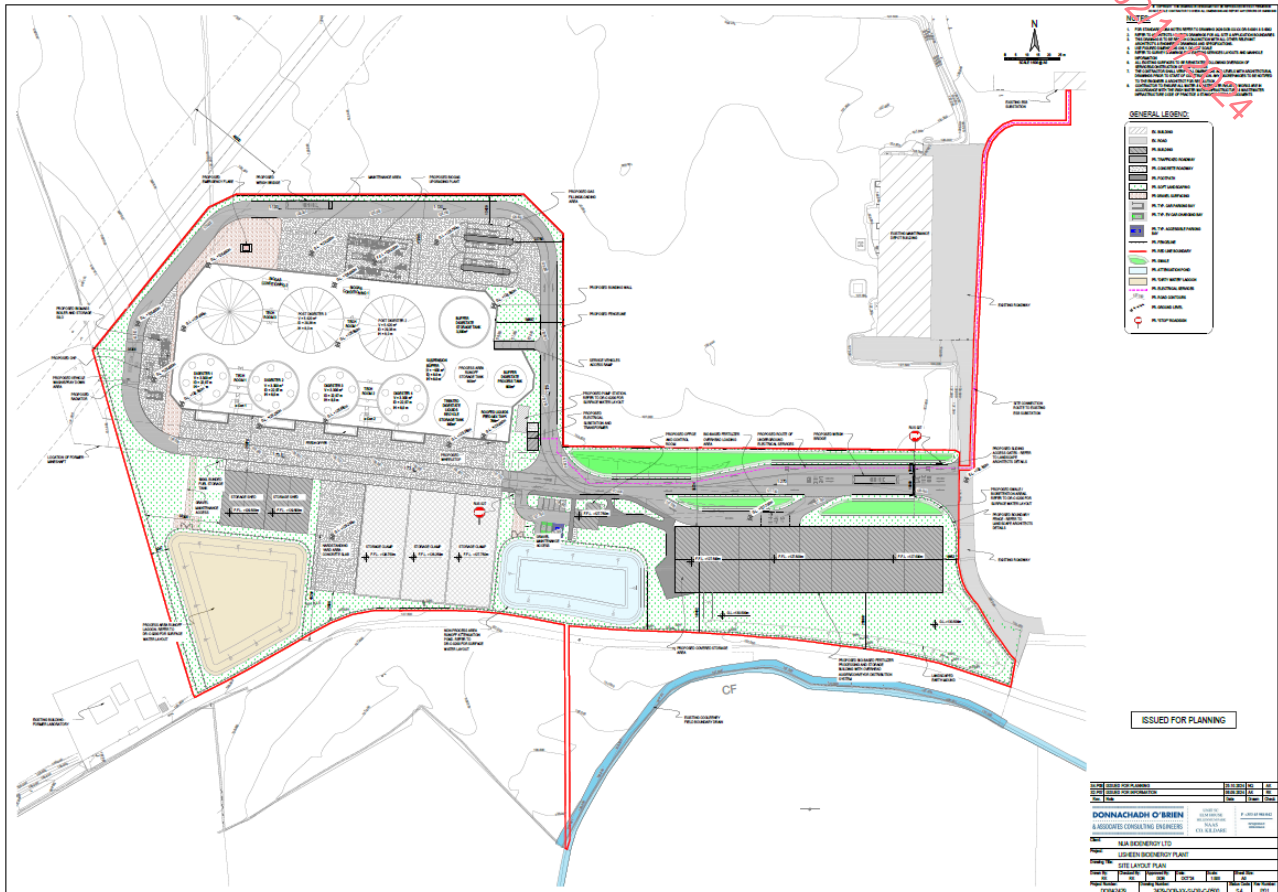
Proposed Development Site Layout (DOBA, 2024)
